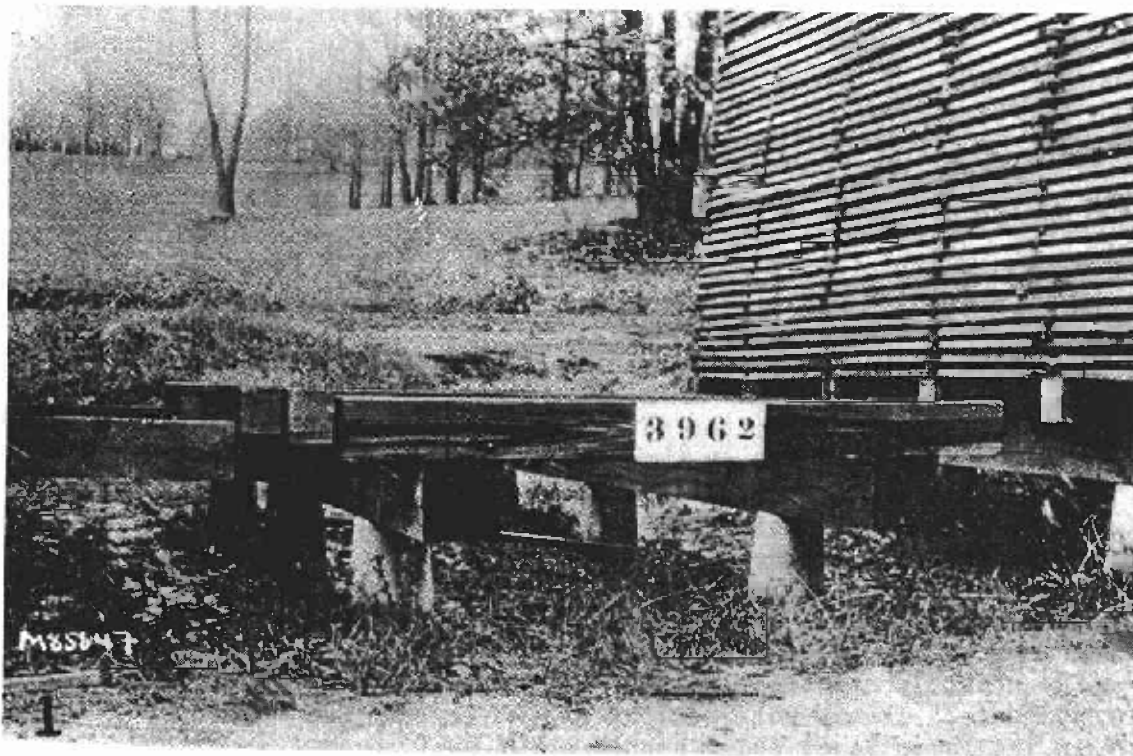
Concrete piers, set at a depth sufficient to insure stability, supporting the stringers and beams of a pile foundation.
